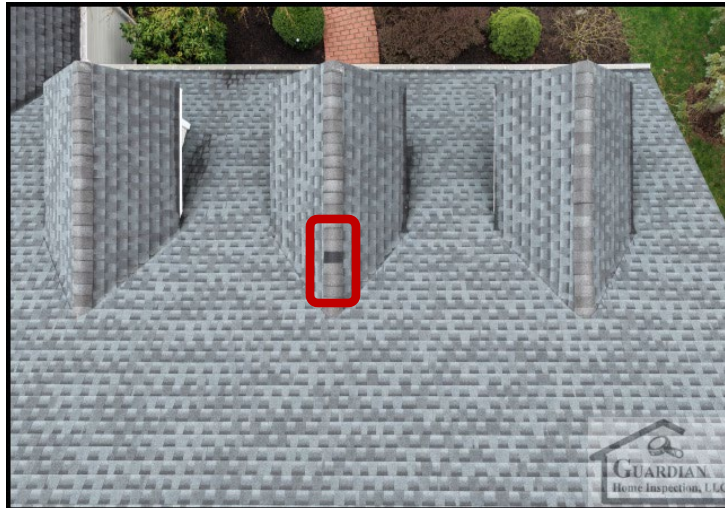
An asphalt shingle, along the front slope of the roof (cap shingle), is missing and should be replaced.
